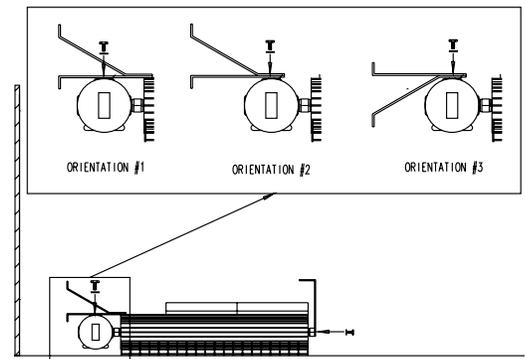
INSTALL MOUNTING BRACKET TO HEATER
